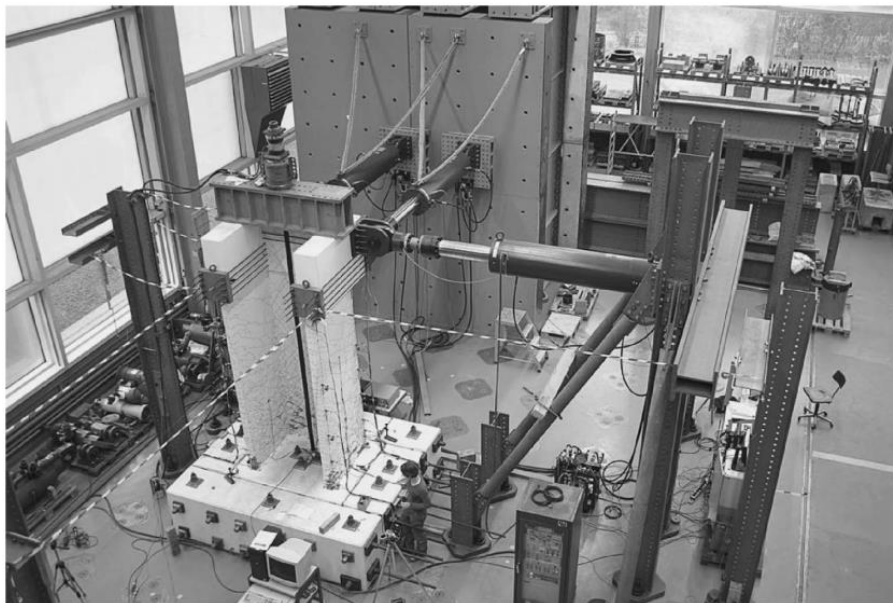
Photo of the test setup used for walls under bi-directional loading (Beyer et al. 2008)
